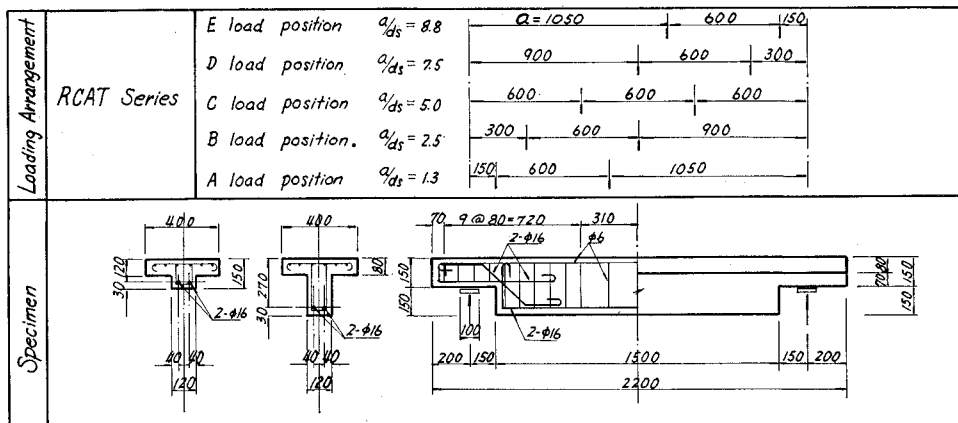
Specimens and loading arrangement of reinforced concrete T beams (moving load test).
